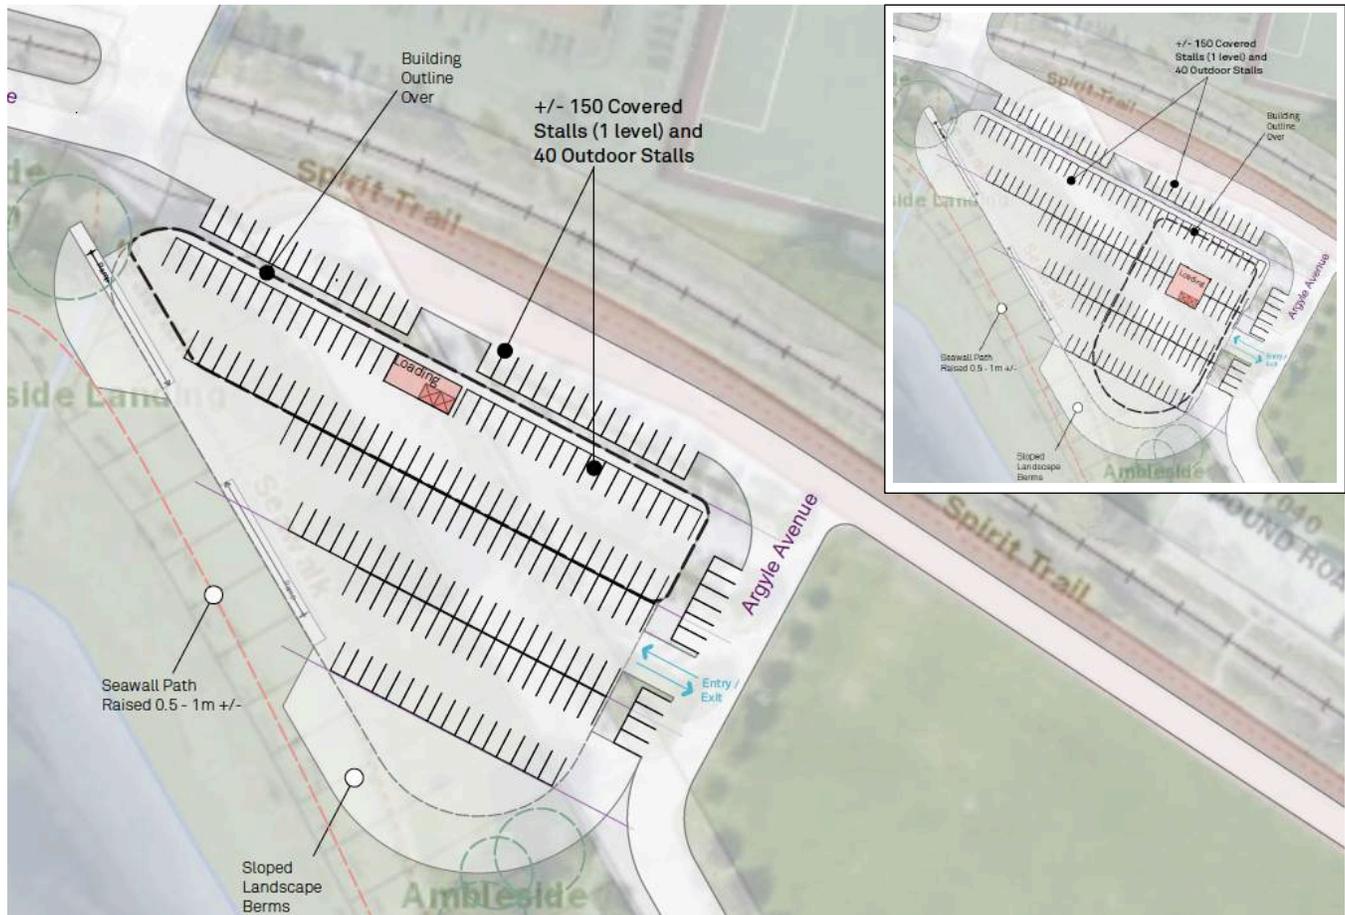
Ambleside Park – Parking Lot Expanded Site: Possible site configuration – Plan view
